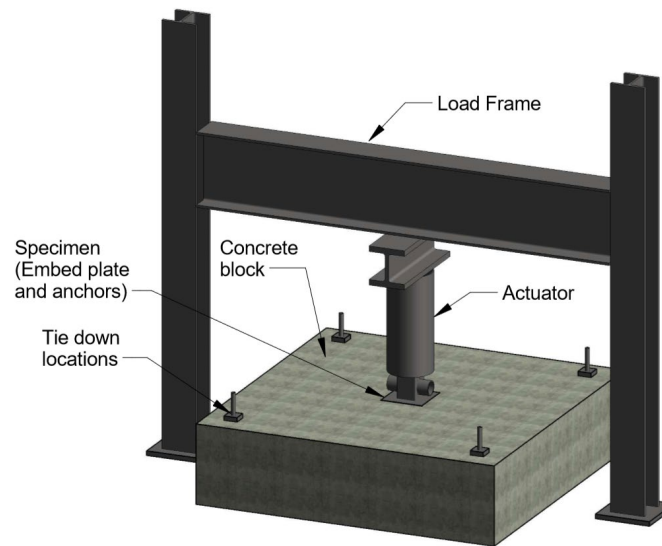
Test frame with the test specimen (Chicchi et al., 2020)
